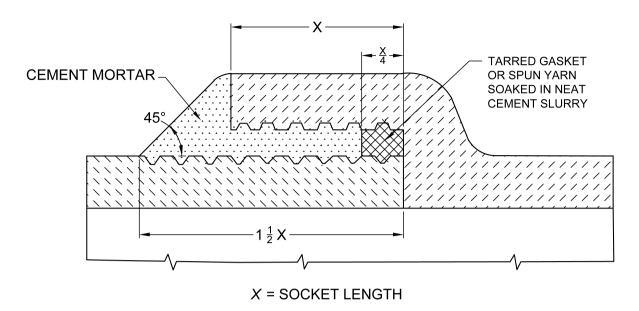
TYPICAL DETAILS OF CEMENT JOINTS FOR GLAZED STONEWARE PIPES
